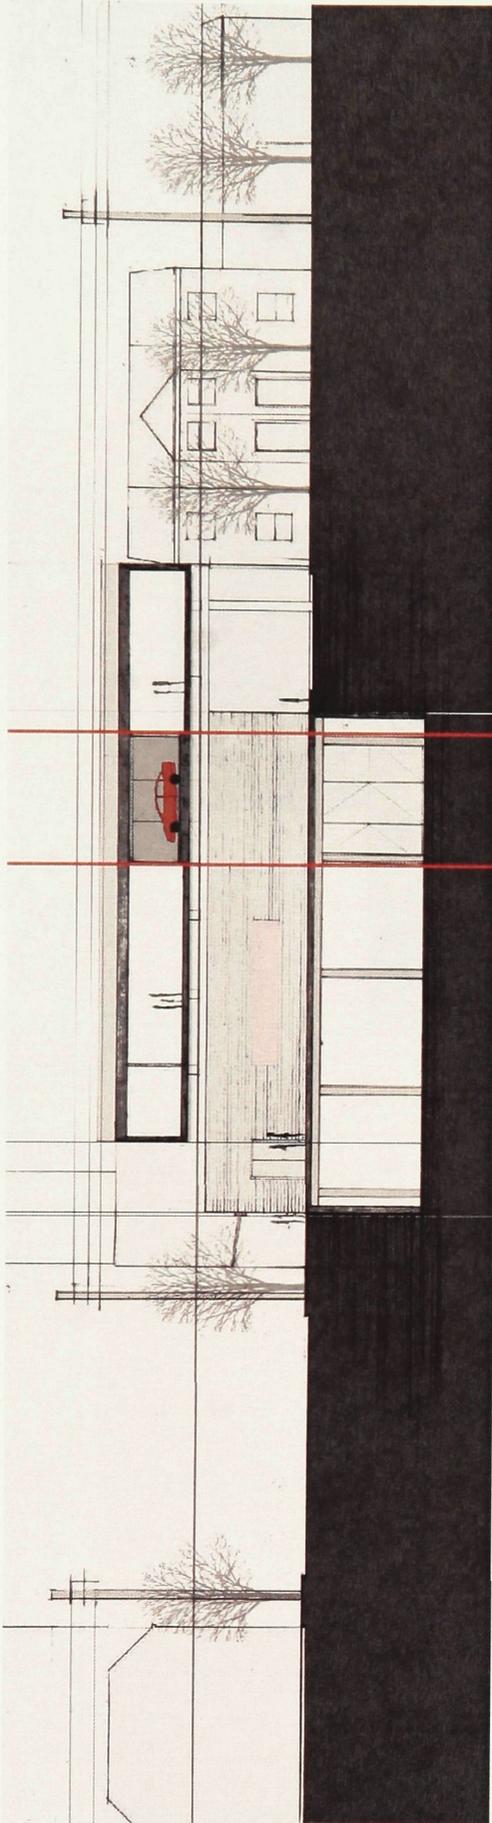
Car Dealership Cross-Section Through Showroom; Parking Garage Elevation
